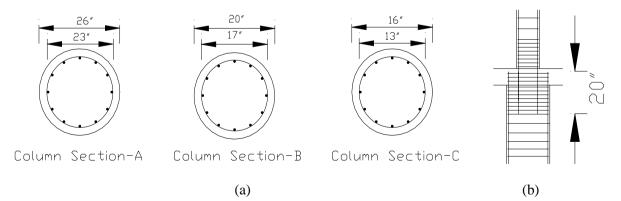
(a) Reinforcement details of column sections, (b) Magnified view of lapping of column reinforcement
